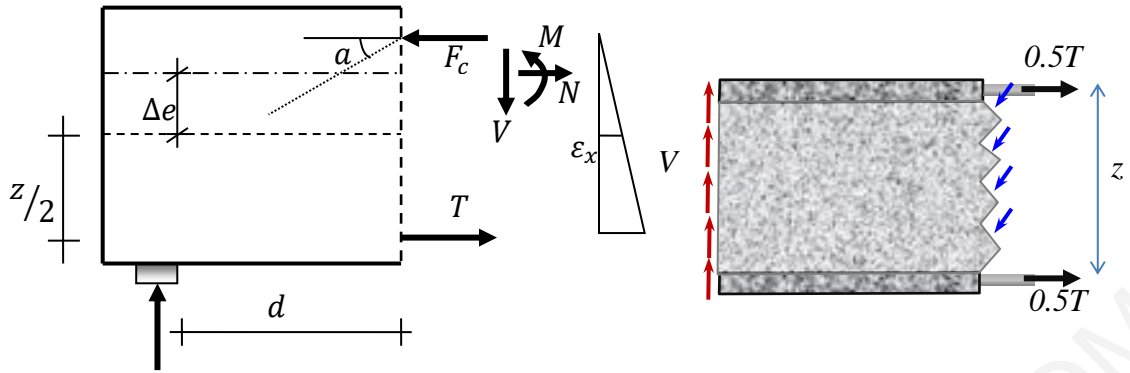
(a) Equilibrium at cross-section and corresponding approximation of strain profiles for end support region. (b) Cracked reinforced concrete: longitudinal tension is required to maintain equilibrium with the diagonal compressive struts (blue color)
